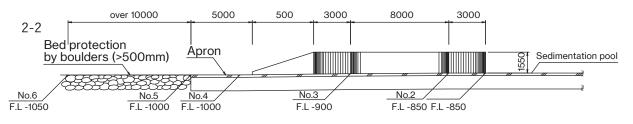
Example Profile Drawing of the Sand Flushing Ditch 3)
